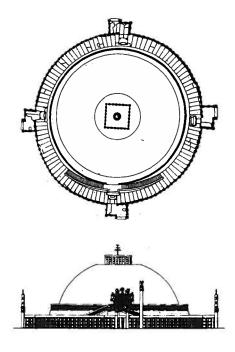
Plan and Elevation of Shachi stupa
